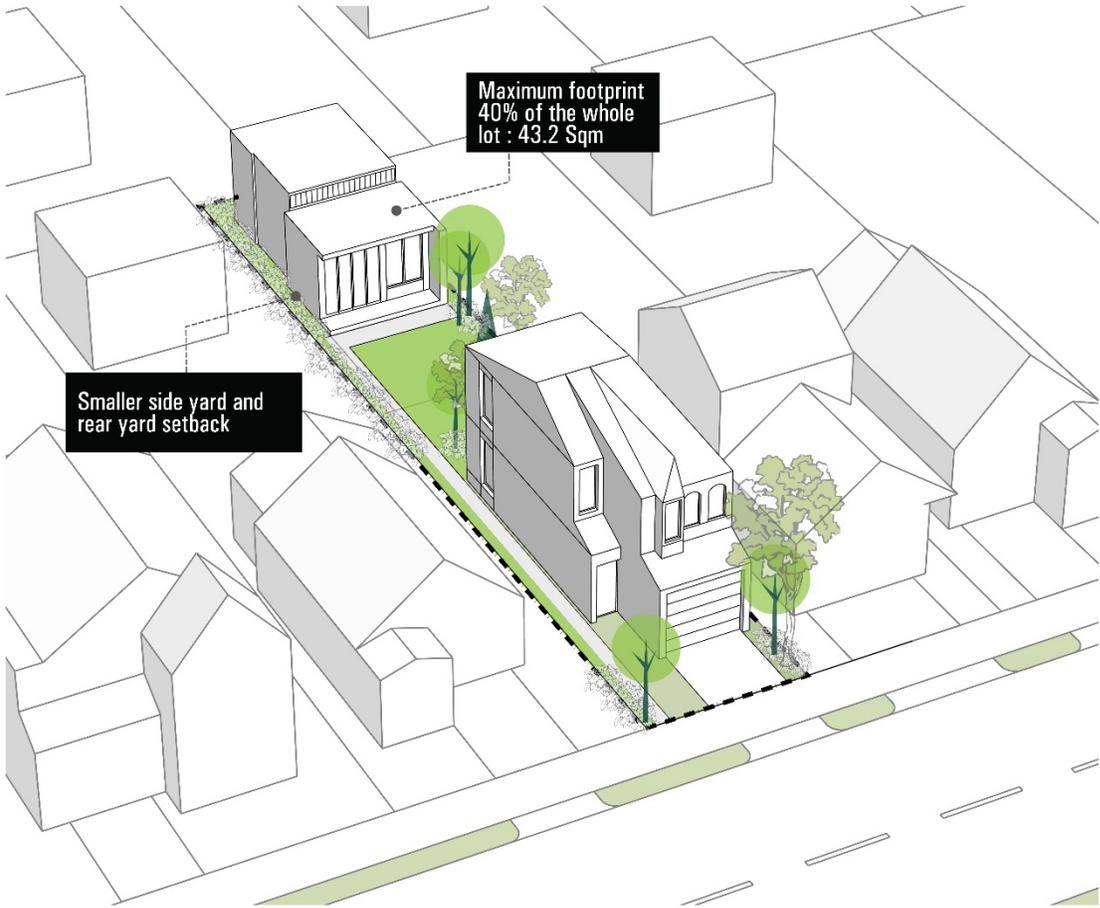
View of garden suite on lot 21 metres wide and 48 metres deep
